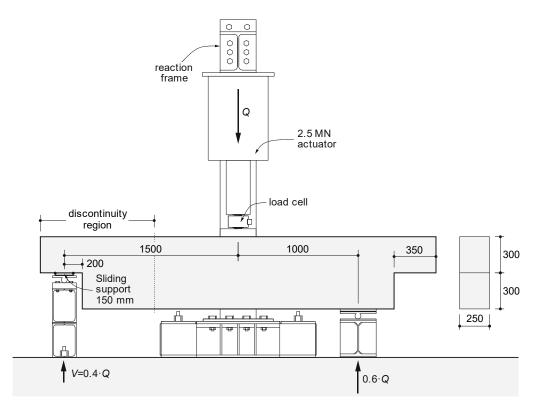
Test setup for 3-point bending experiments on reinforced concrete dapped-end beams (dimensions in mm).
